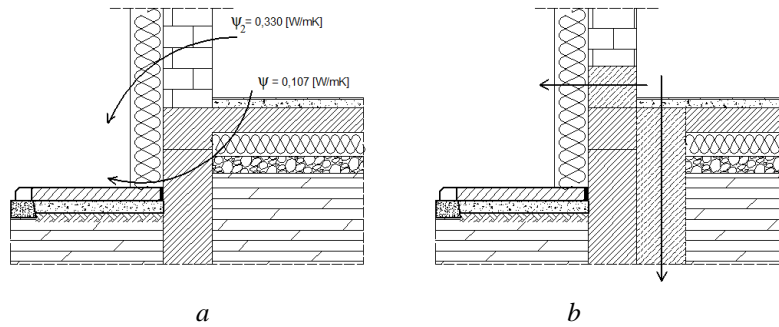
a* – Typical thermal bridge; *b* – modified geometry of the thermal bridge.
